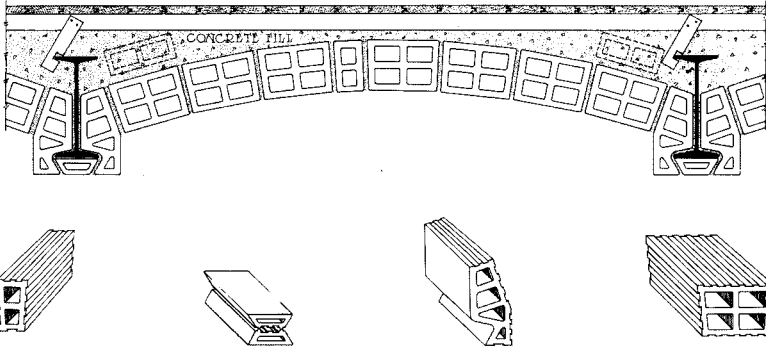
Early twentieth century end pressure, hollow tile floor arch (from Hollow Building Tile Association, Handbook of Hollow Building Tile Construction, 79).
